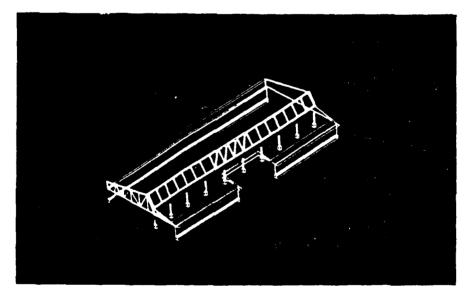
Conflicts in placement of components can be detected, e.g., the girder and roof.
